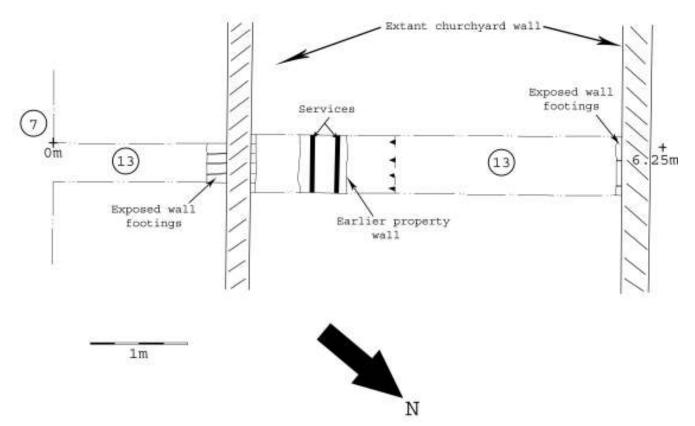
Plan of trench 13. 1:25 scale. See fig.11 for location of trench
